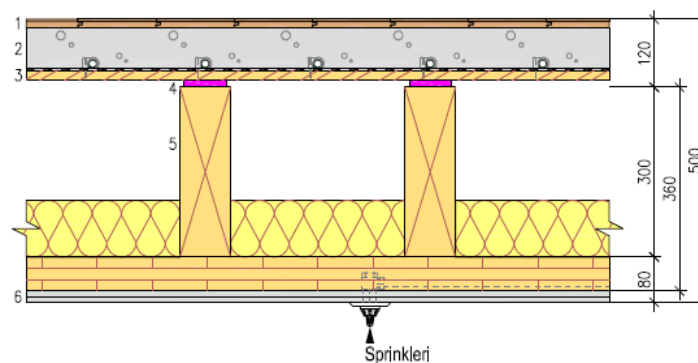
Build-up of intermediate floor type VP801KRL, RunkoPES 2.0. Authors note: The structural detail drawing includes a sprinkler. According to the National Building Code of Finland sprinklers are mandatory in timber framed buildings from two stories upwards. (Finnish Wood Research 2013b)
